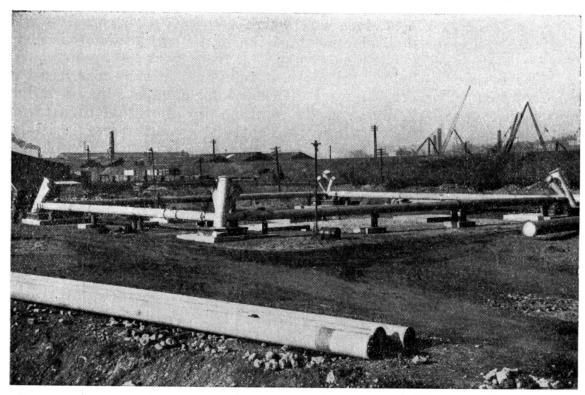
Base unit of Tower erected at Messrs. Tubewrights'trial assembly site
